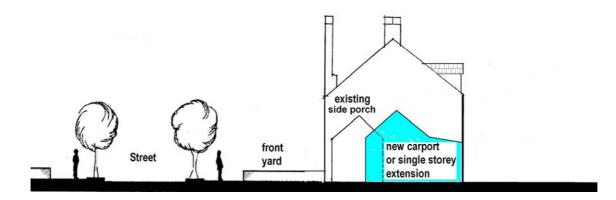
Side view – a new addition used as a carport, garage or dwelling space must be set behind an existing side porch. Roofs must be parallel with the slope of the existing roof or porch and use the same roofing material.
